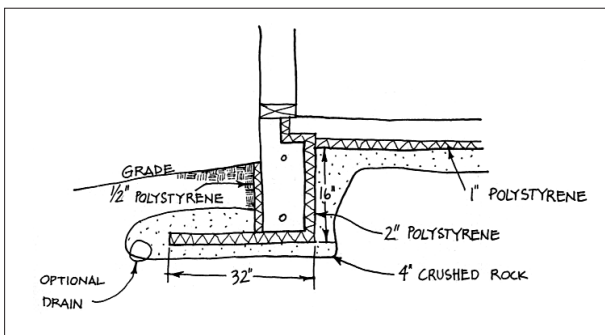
The shallow foundation only works as a complete system: Four inches of crushed gravel beneath the footing keeps water from wicking up. Half-inch foam on the outside of the foundation wall keeps frozen soil from lifting up the foundation. The subsurface drain keeps water from ponding near the footing.
